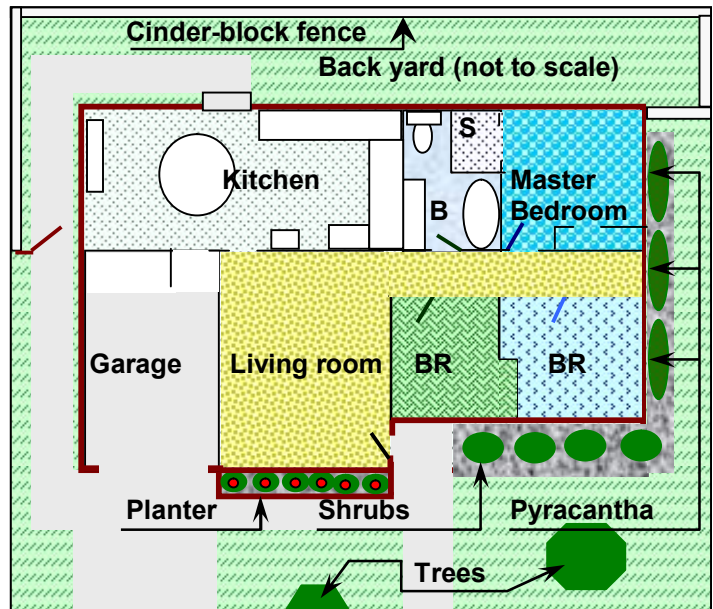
Floor plan of our home in Farmington, New Mexico, our first purchased house.
